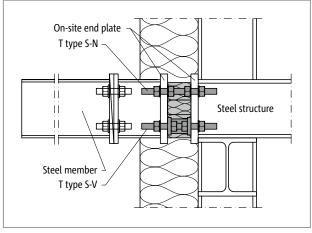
Schöck Isokorb® T type S for cantilevered steel structures ; including first fix bracket
